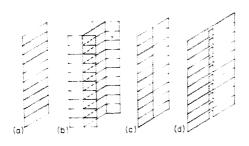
PRECAST WALL CONFIGURATIONS (Shading denotes a simple wall)
